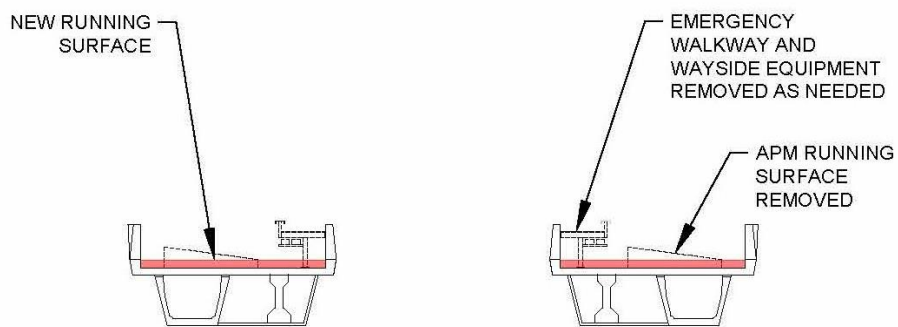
Potential Retrofit AV Guideway Cross-Section at Curves (Approaching/Departing Stations)
